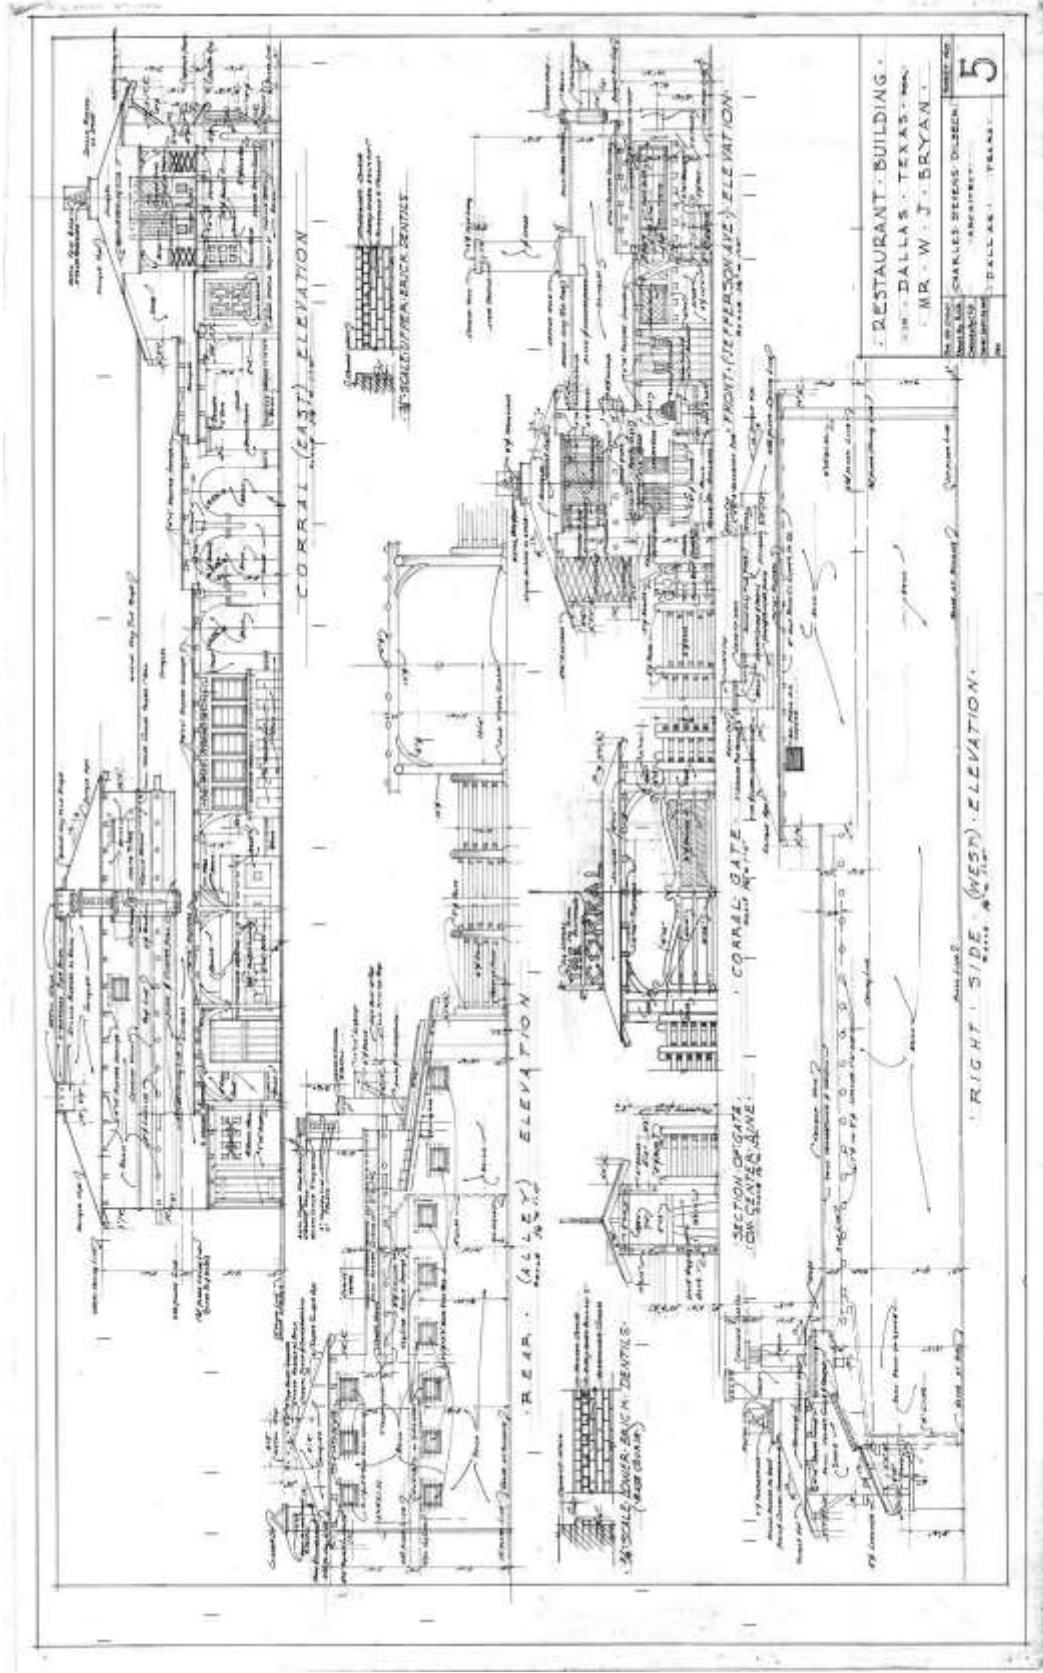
Original architectural drawing by Charles Dilbeck – Elevations. Courtesy of Willis Winters, FAIA.
